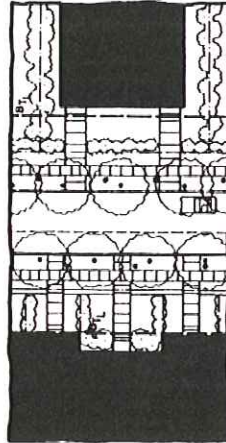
Typical street section with narrow pavement width, street trees, sidewalks on both sides of the street, and on street parking one side of the street (Source: Nelessen, 214)
